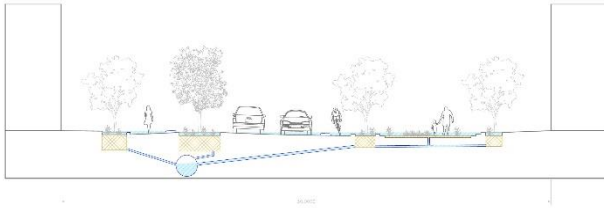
Shows an example of street reconfiguration, redistributing the existing space to increase stormwater detention capacity within the streetscape. Image credit Anna Müller
